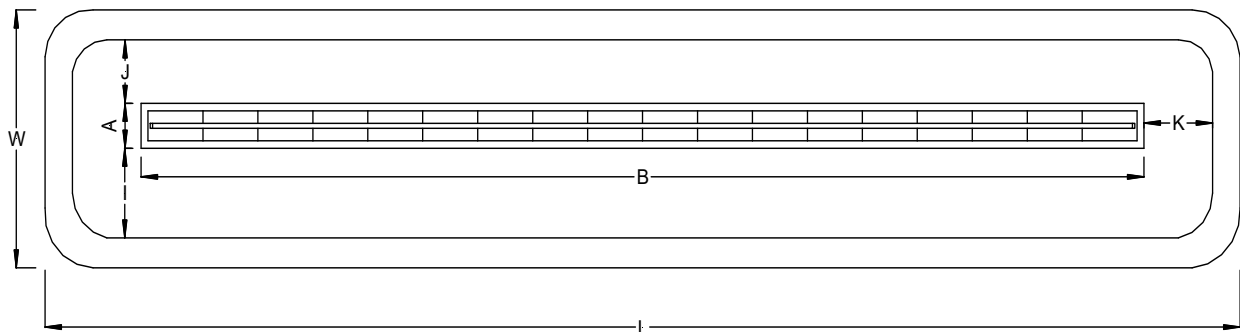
PLAN VIEW – MOUND SYSTEM
